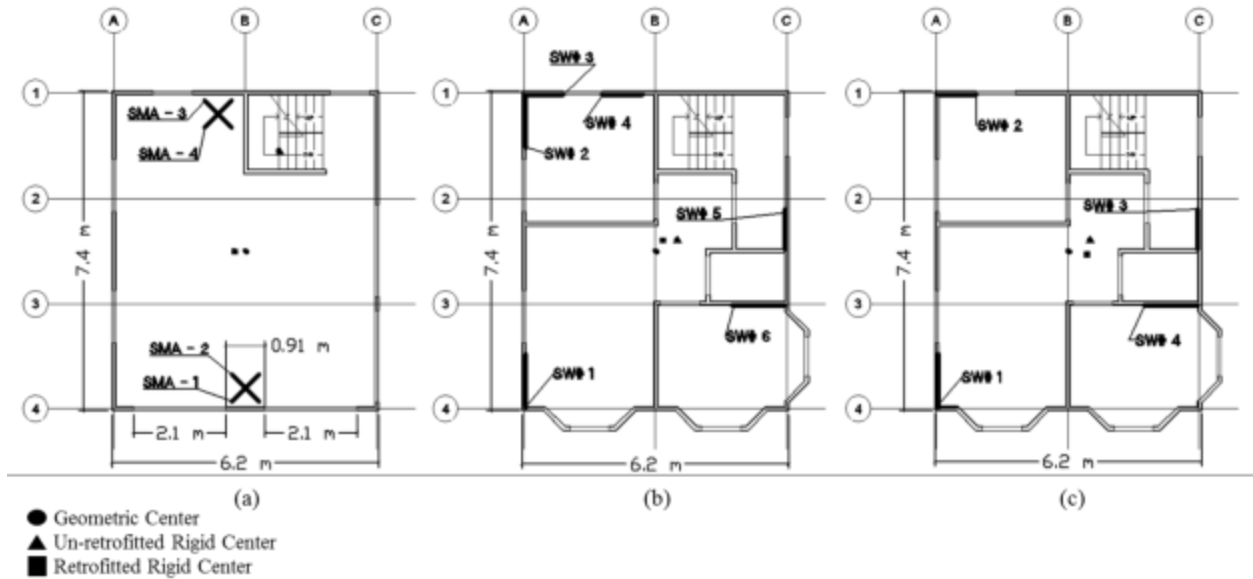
SMA-Retrofitted Test Building Floor Plan with Centers:
